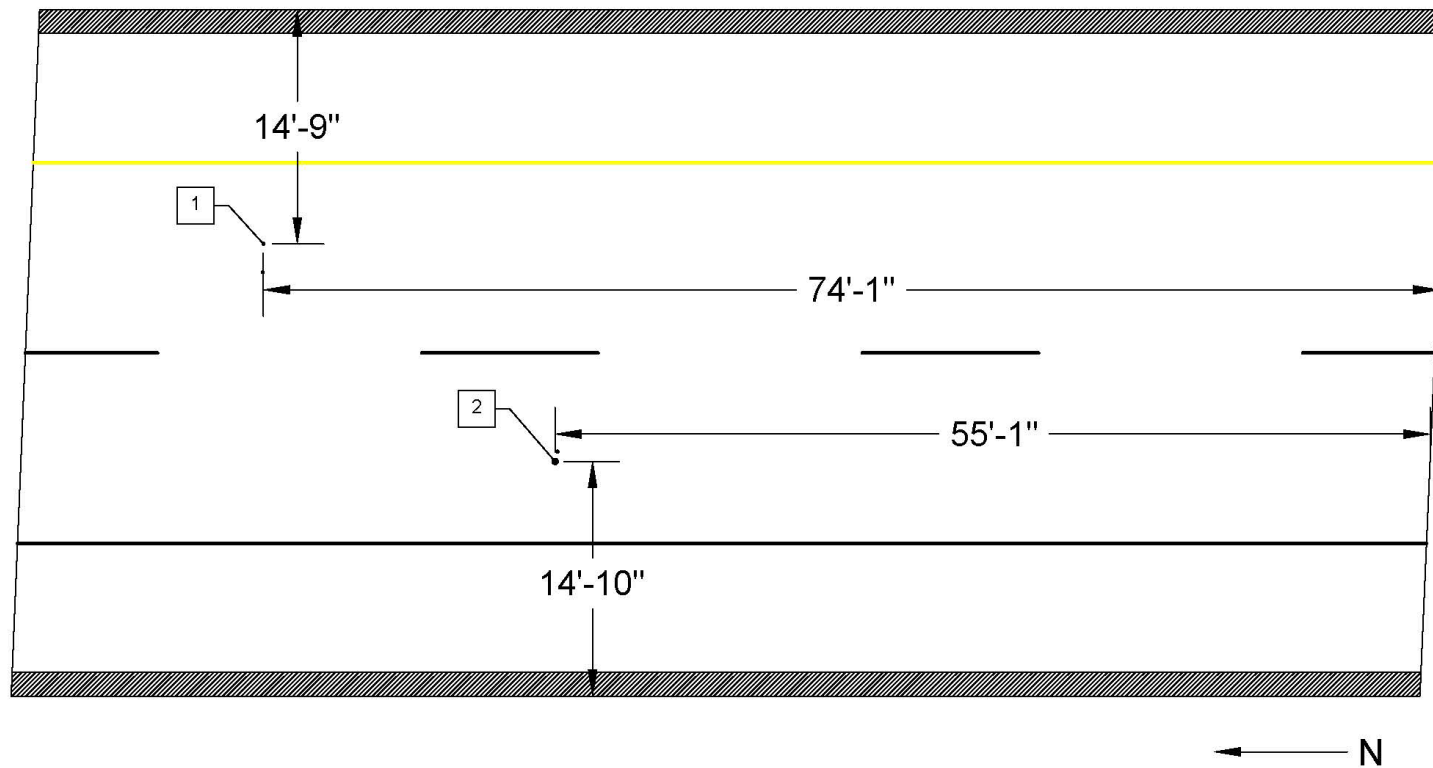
Location of all sensors installed in Upper Ridge Road NB deck.
